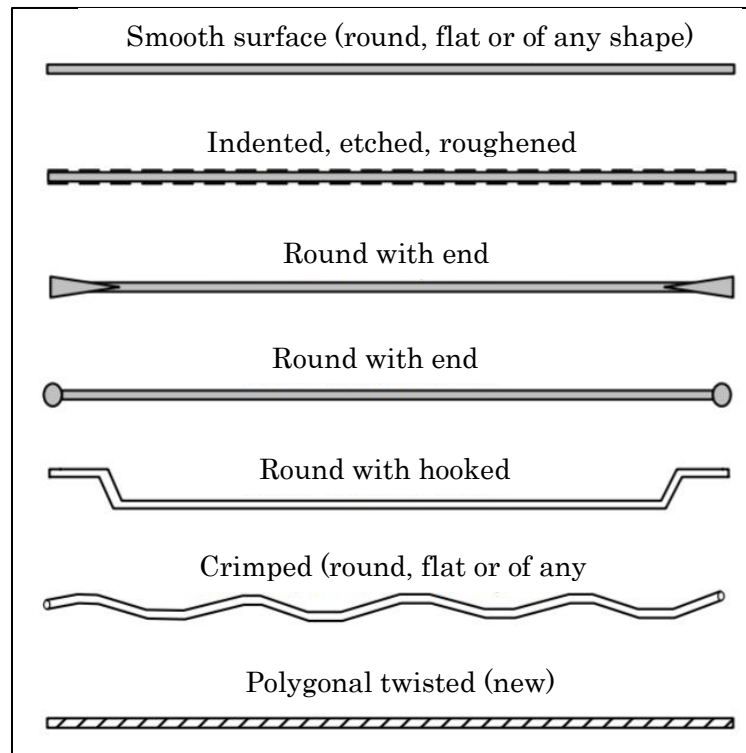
Typical Profiles of Steel Fibres Commonly Used in Concrete (Naaman, 2003)
